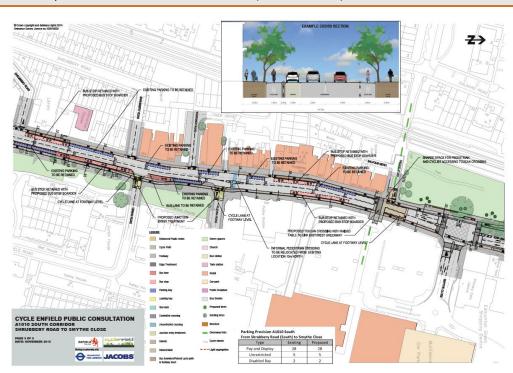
Proposed Plans for Edmonton Green (Southern End)
